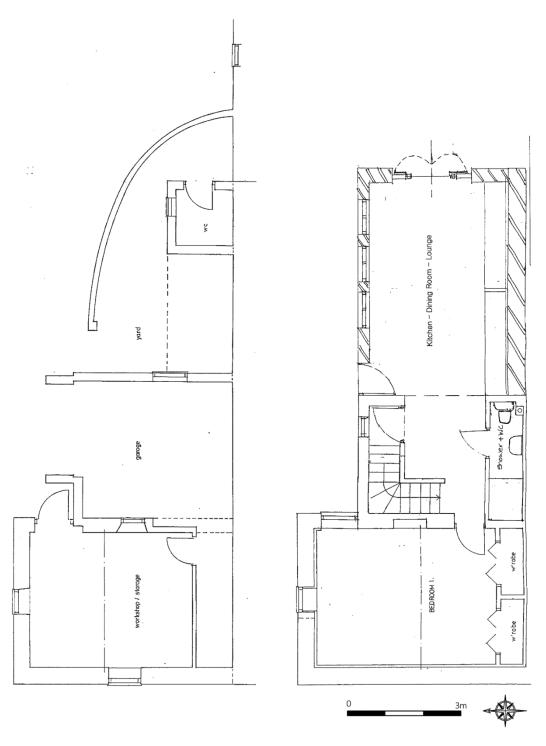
Existing and proposed ground floor plans (scale 1:100)
